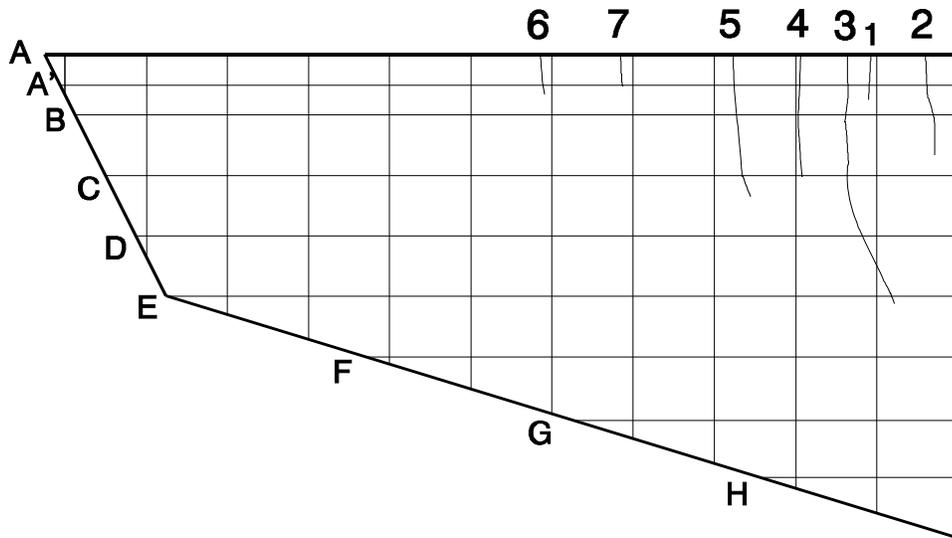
POJ-RC-100-TH cracking pattern on south face of overhang at dead load
